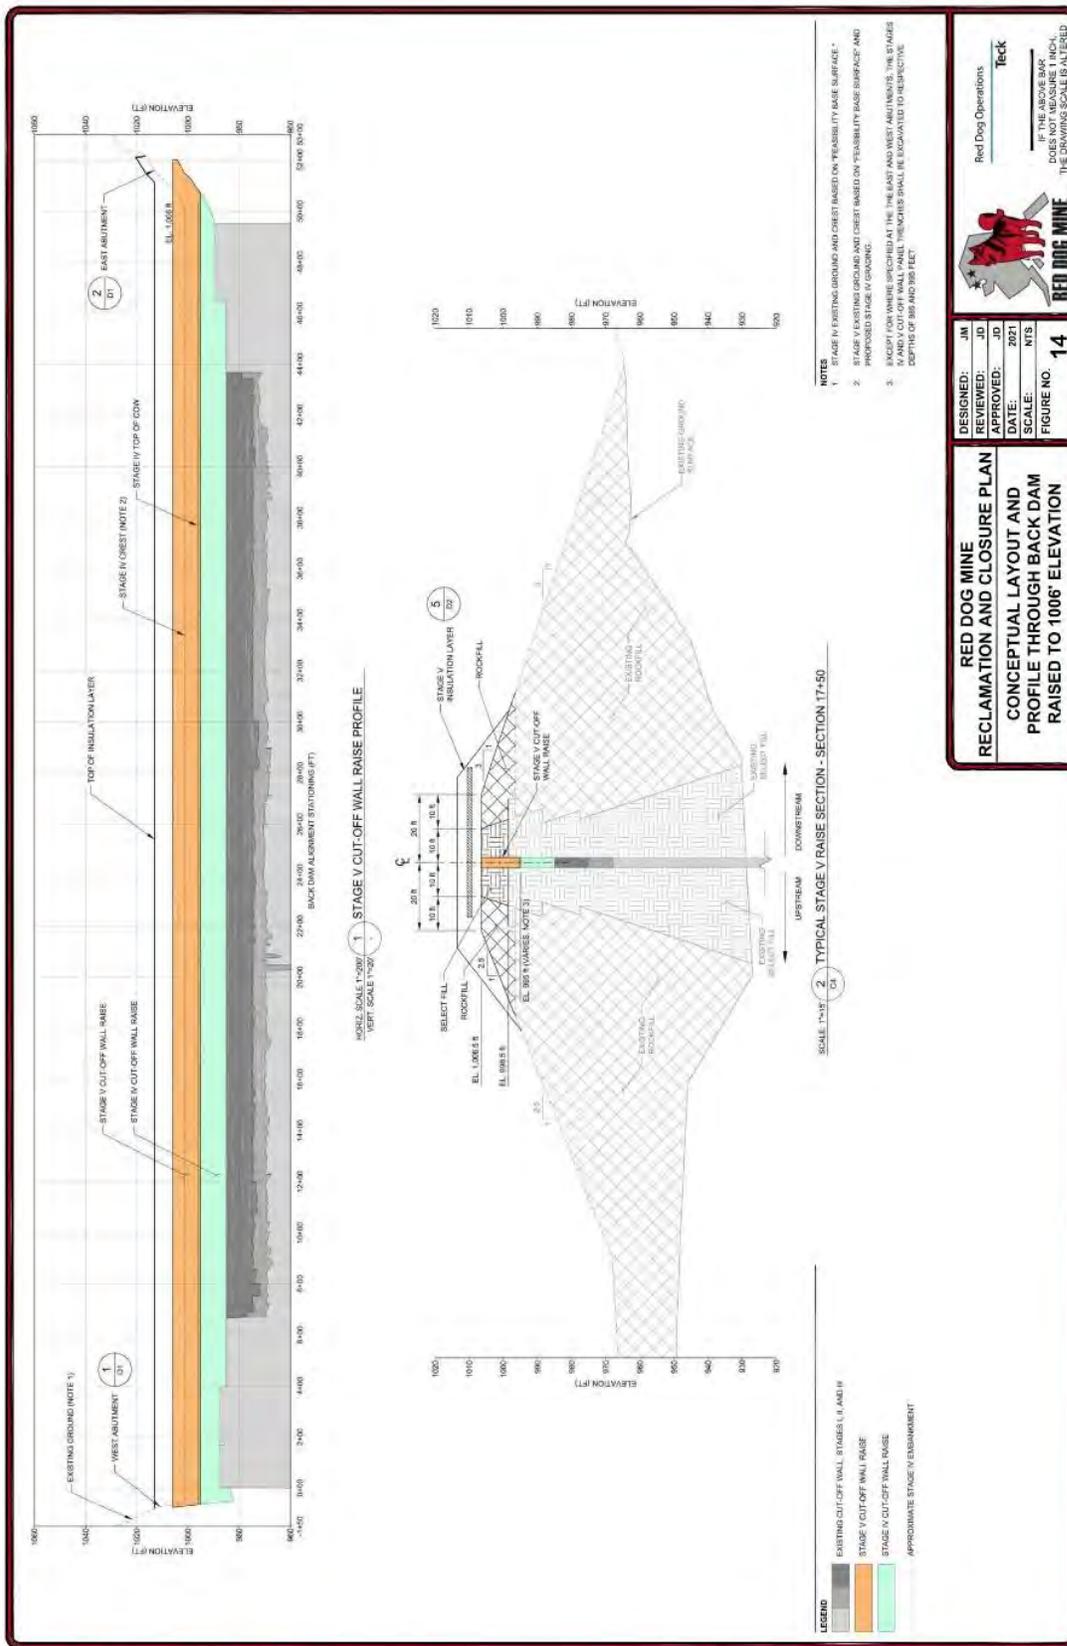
Layout and Profile through Back Dam Raised to Elevation 1006 ft
